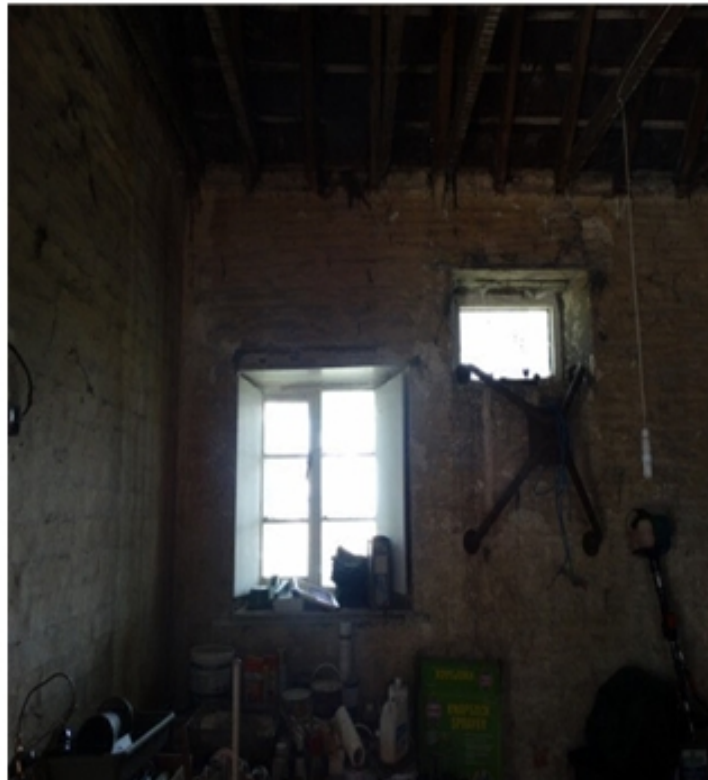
inside the Stables looking north showing the windows : 01.08.16.
